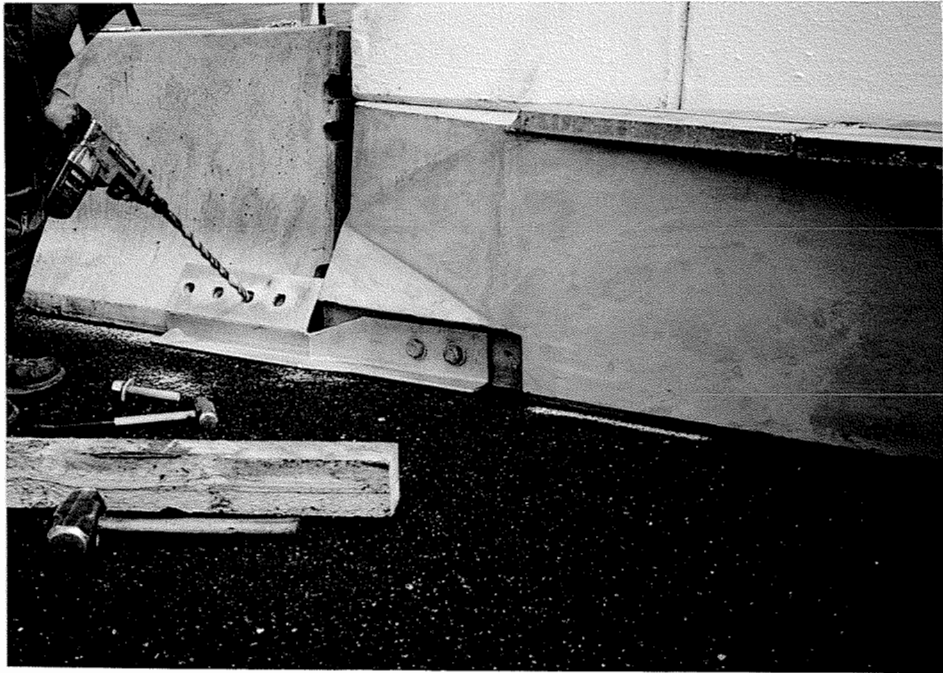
Holes are drilled in the existing barrier for the connection plate.
